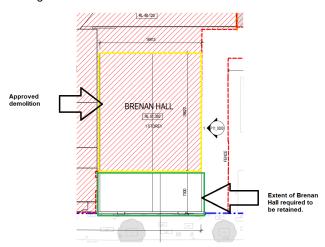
Partial extent of demolition of the Brenan Hall approved under Planning Permit PLN20/0567.
